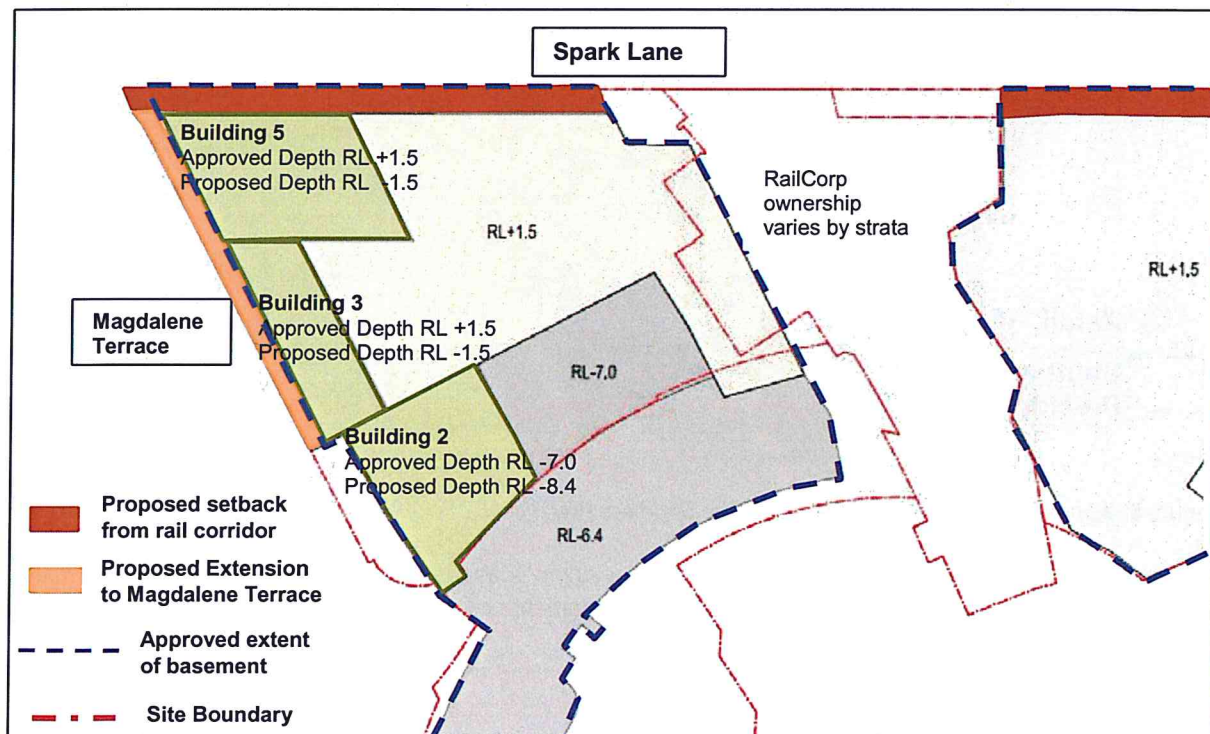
Approved and Proposed Extent of Basement Excavation and modification
